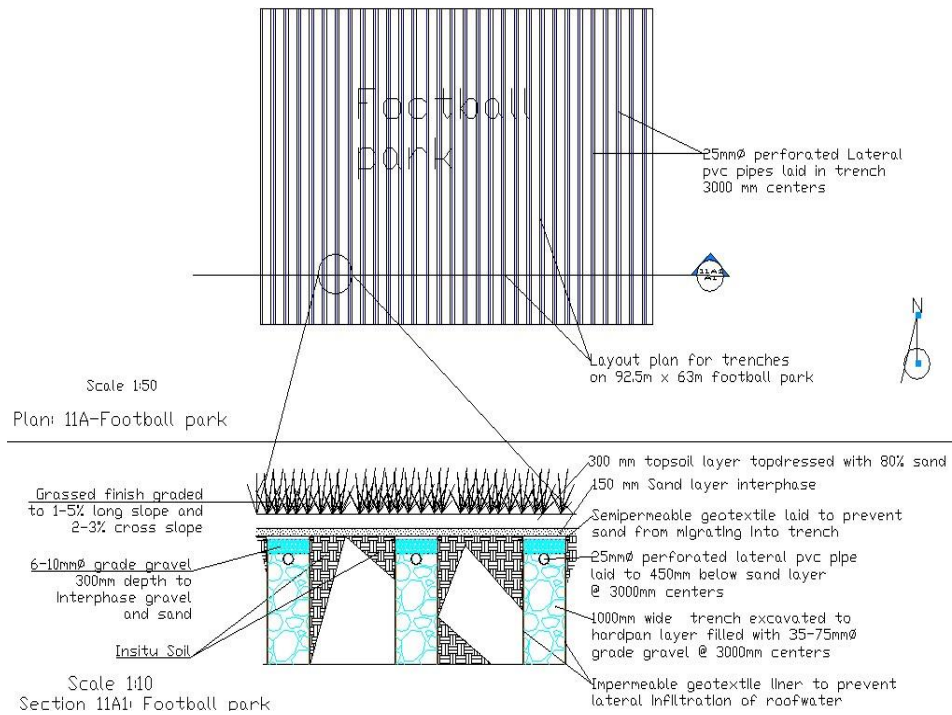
6: Detailing LLSite1 11A - Infiltration trench on Football park
